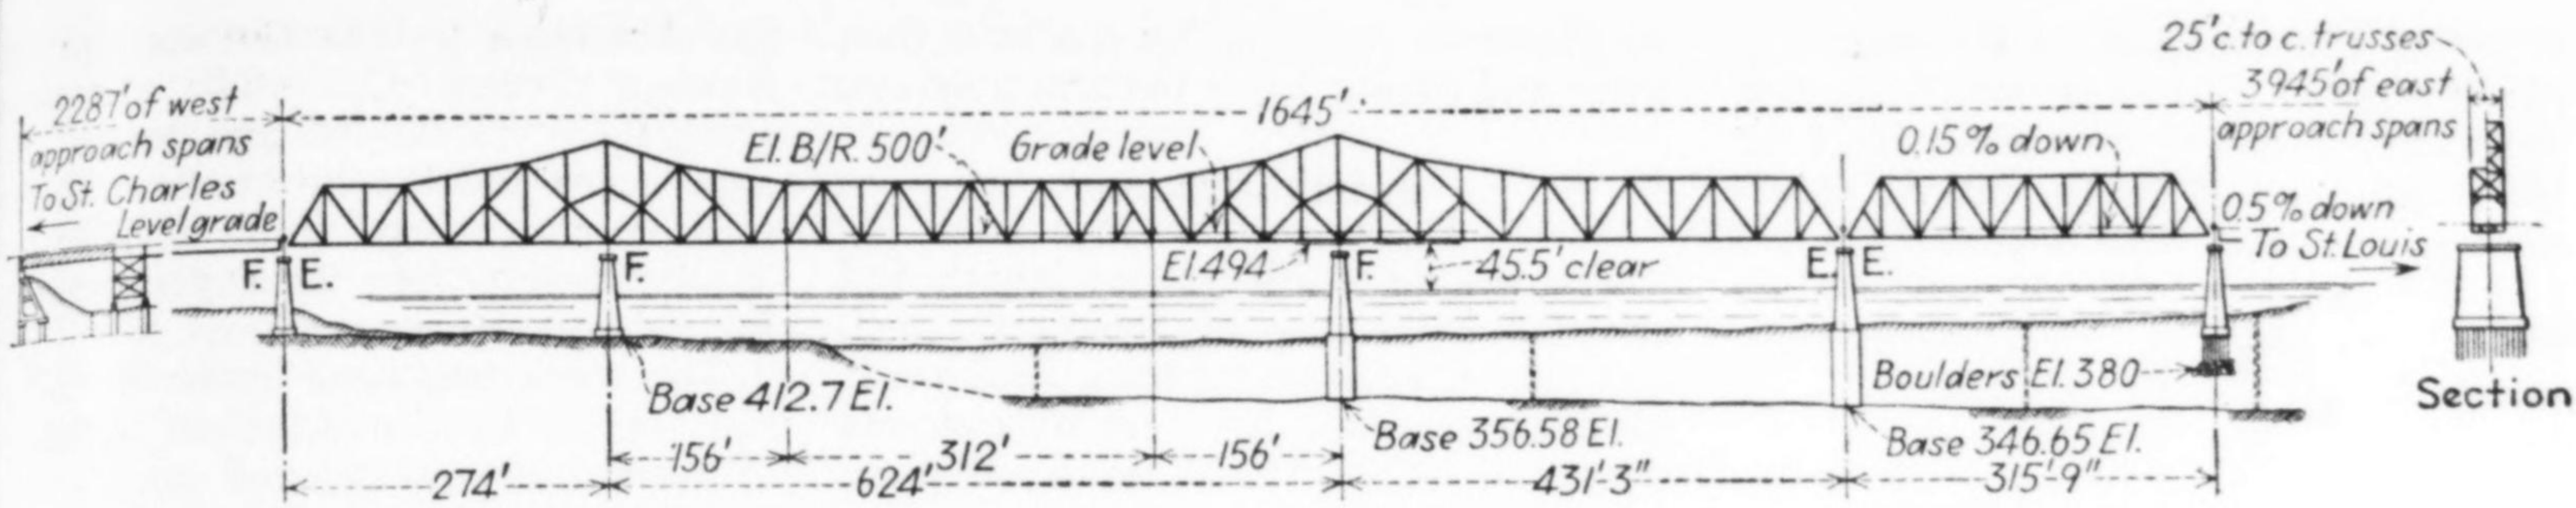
UNSYMMETRICAL anchor spans and a suspended span that is a duplicate of the simple approach span characterize the new Wabash Ry. bridge over the Missouri River at St. Charles, Mo.
